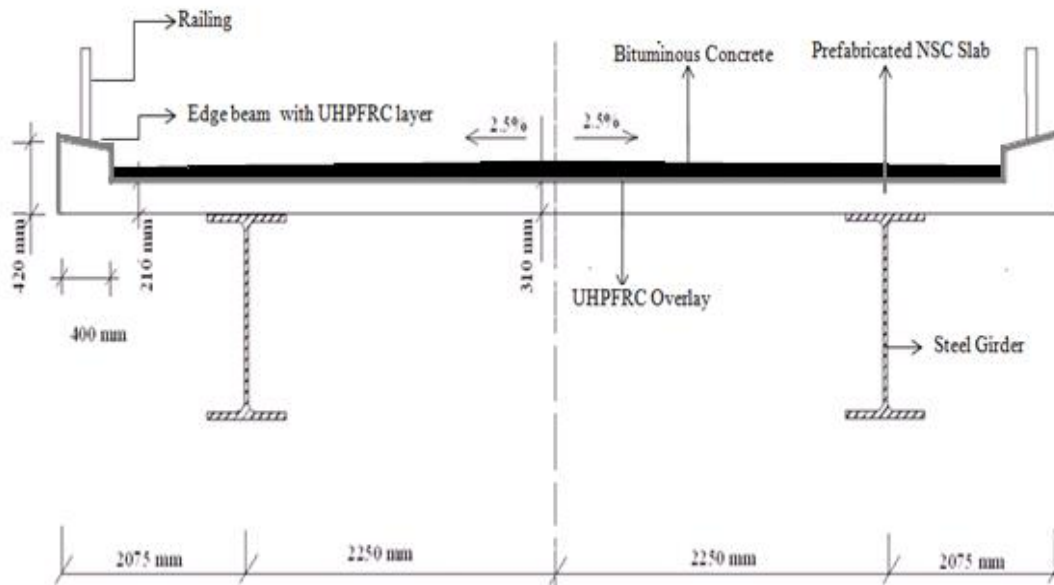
Proposed cross section of the composite bridge deck with NSC prefabricated Slab and UHPFRC Overlay
